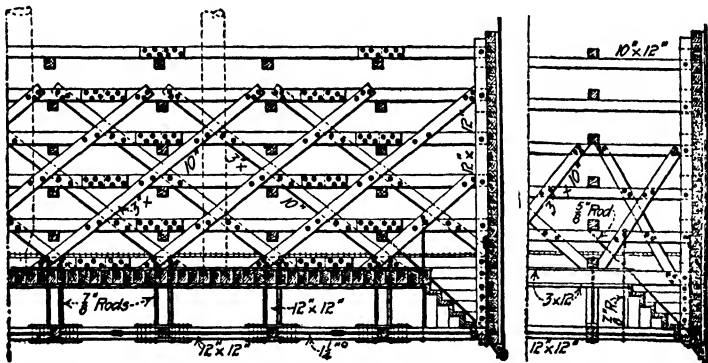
Half Longitudinal and Half Transverse Sections, Municipal Bridge.
